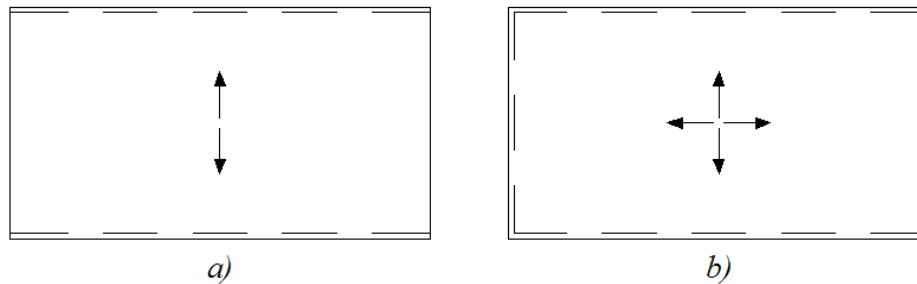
Load carrying in a) one-way slab, b) two-way slab.
